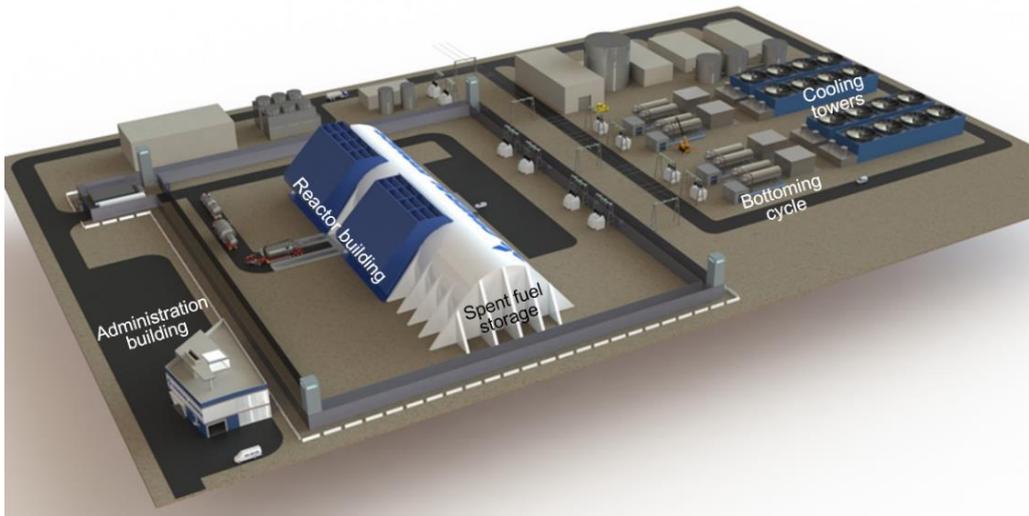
Site plan for baseline plant arrangement with net 1060 MWe to the grid
